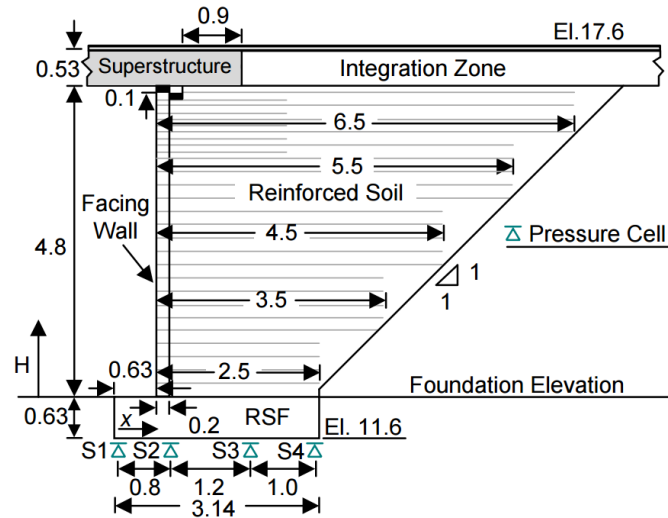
GRS-IBS cross-section along the roadway centerline (all dimensions shown are in m).
